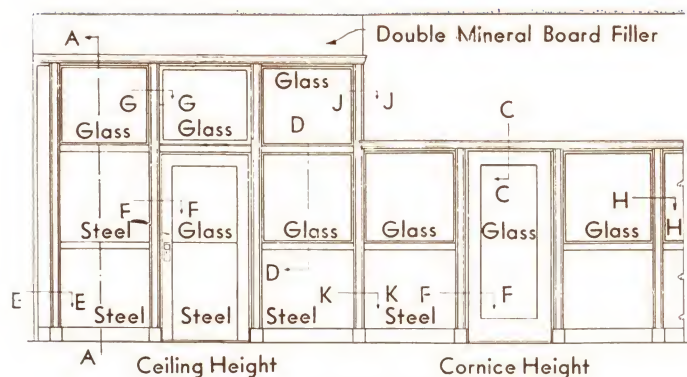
Sneed Mobilwall Type SF-3, 7'-2" high, finished to harmonize with building walls and doors.
